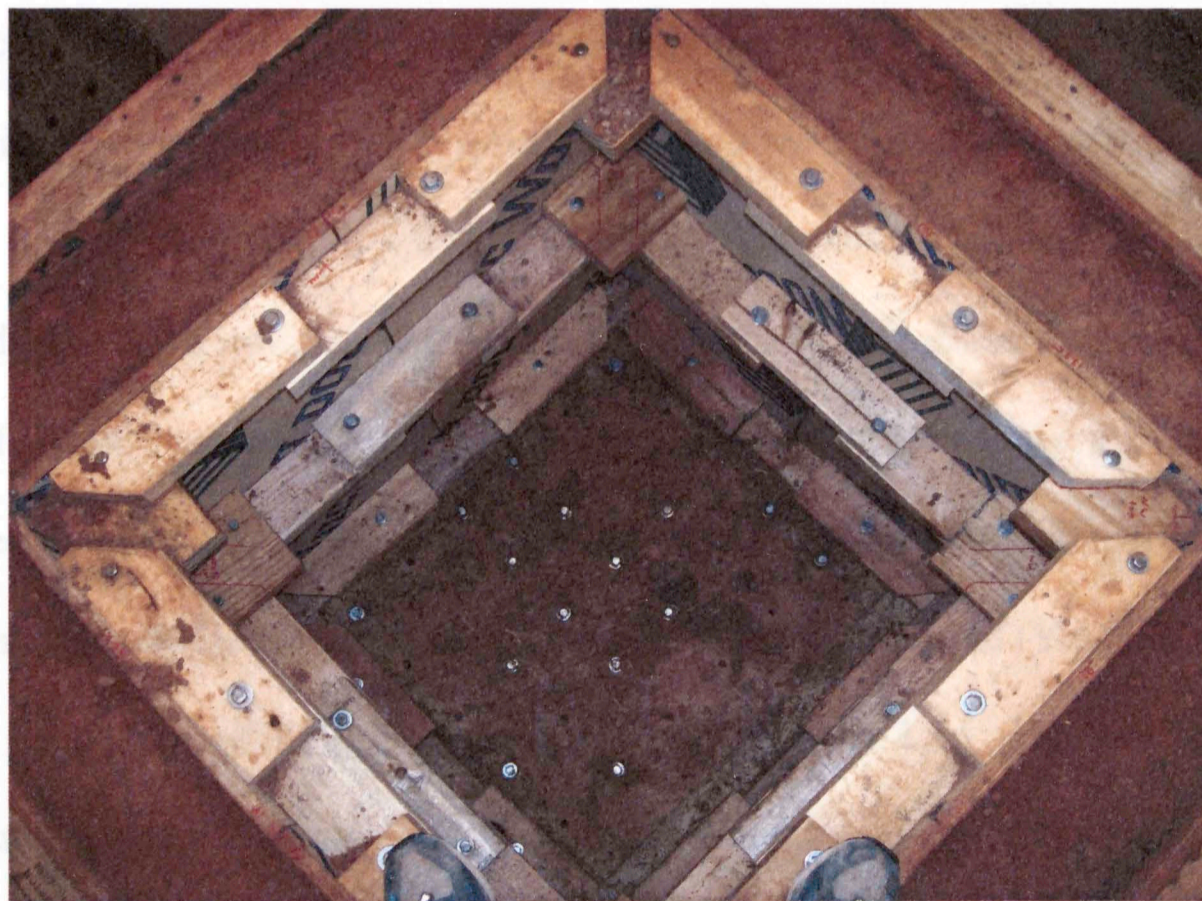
Plan view picture of all inner wall formwork (Test 1)
